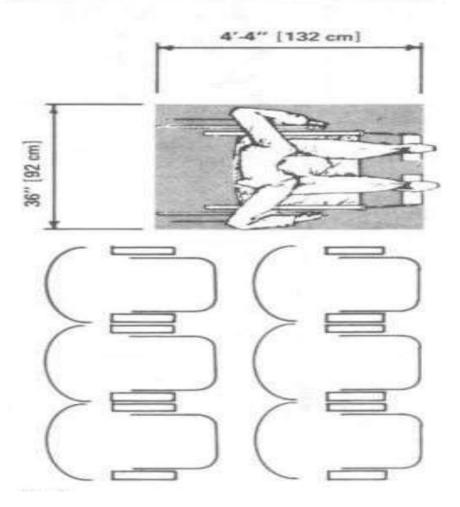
Accessible seating arrangements without desk facilities (Assembly/Seminar room/etc.)
